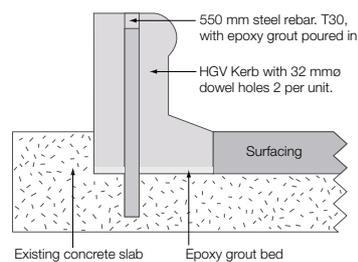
HGV Kerb: HGV with dowel bar – typical detail for use on bridge deck, etc.
